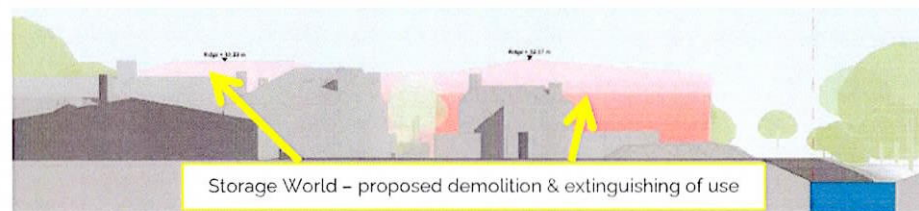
Excerpt from Applicant's proposed demolition elevations (2)
